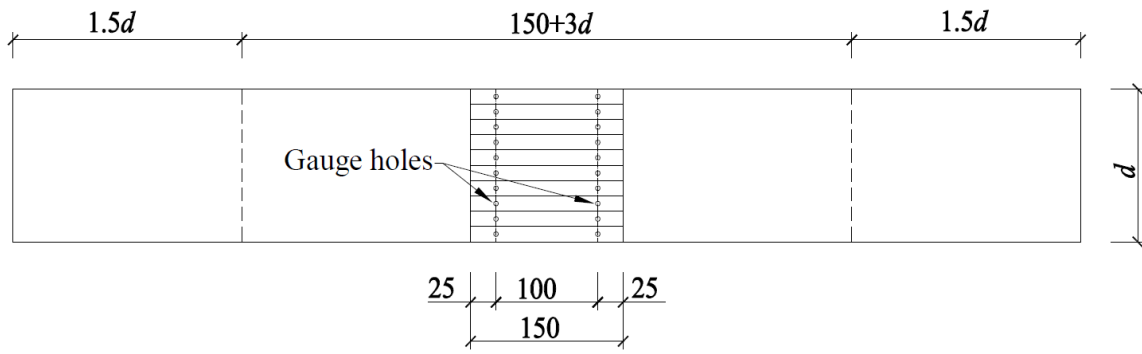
Location of strips cut for residual stress measurements (dimension in millimeters).
